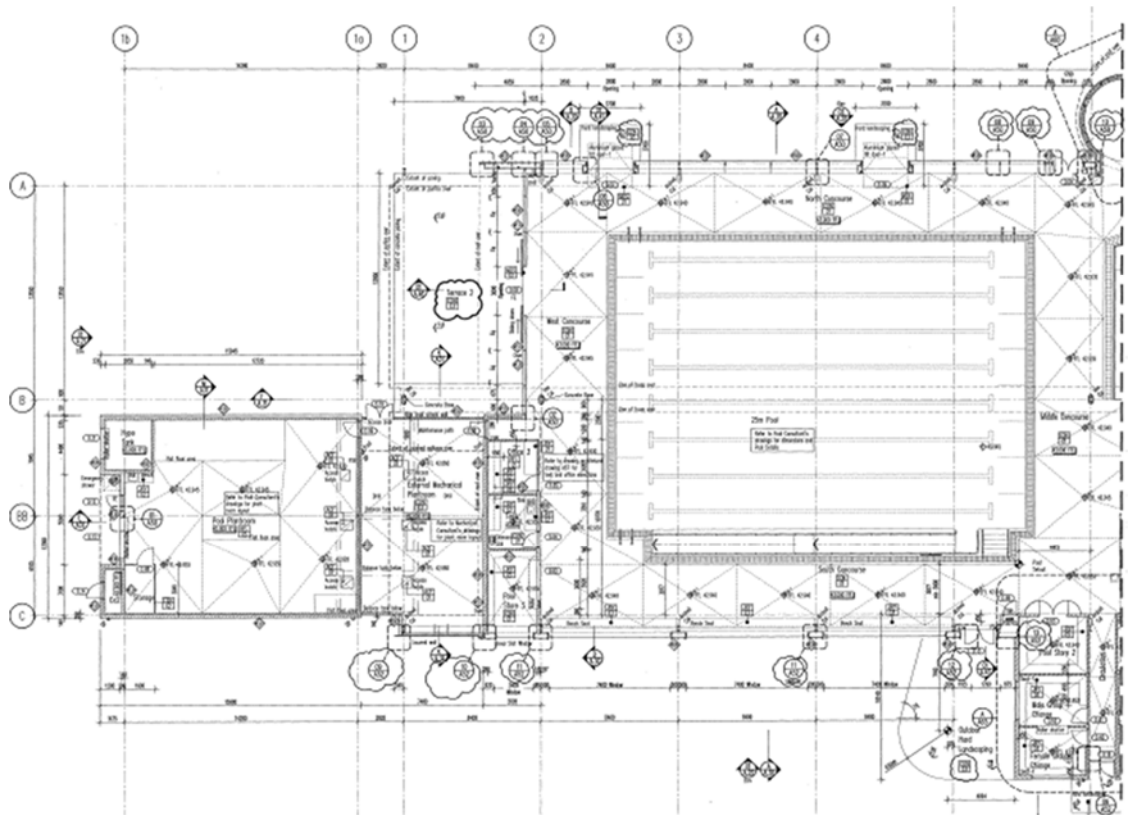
Floor plan of the sample swimming pool hall (west wing).
